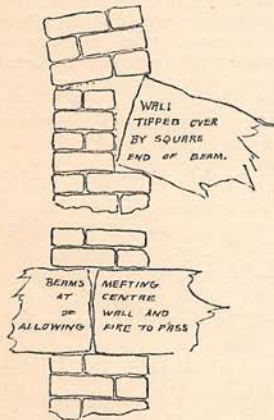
BAD METHODS OF RESTING BEAMS ON WALLS.
